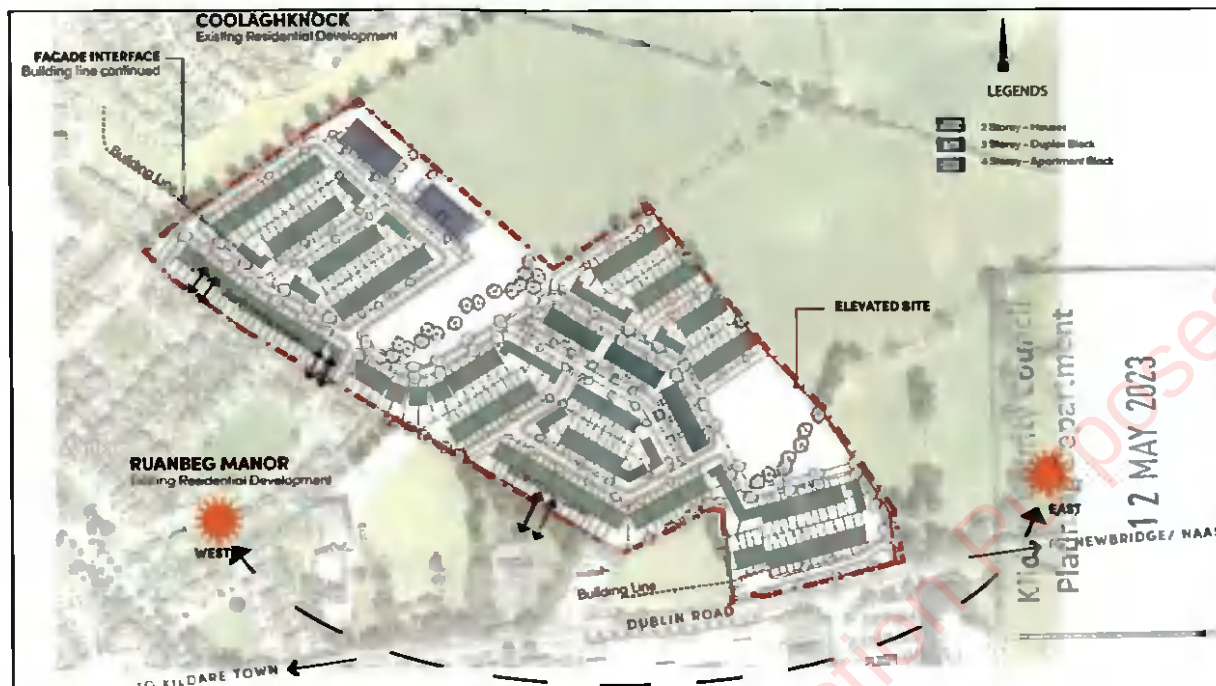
Alternative A Site Layout Plan prepared by MCORM Architect's
